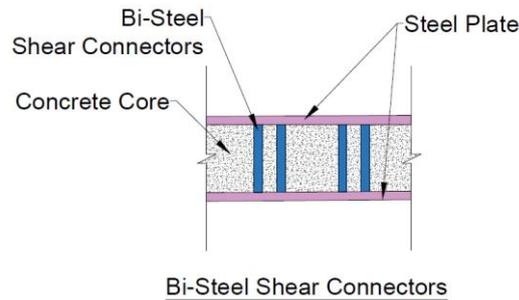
SCS sandwich with Bi-Steel shear connectors.
